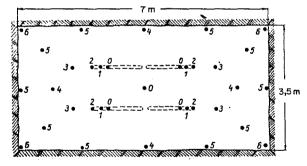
Drilling pattern in a rectangular-section shaft.
